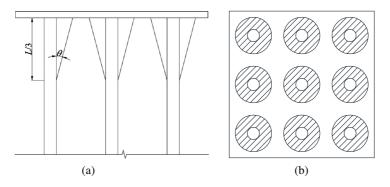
Load transfer diagram of rigid pile composite foundation: a) Elevation, b) Plan
